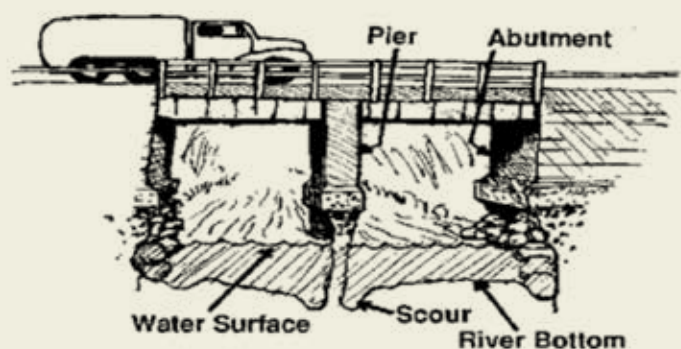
Bridge Scour at Pier and Abutment [25]
